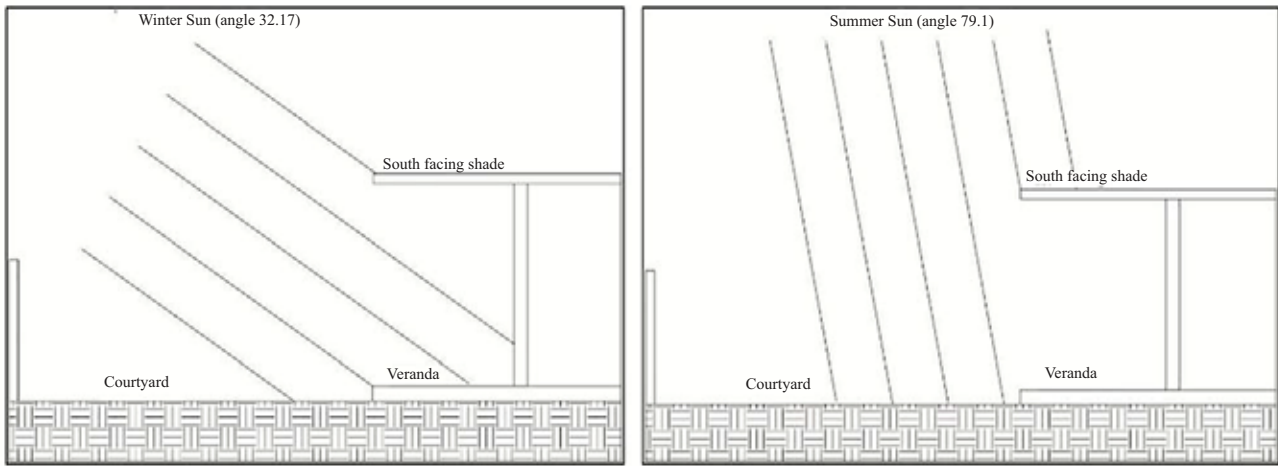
Section of typical house from 1990-1999 with summer and winter sun angle.
